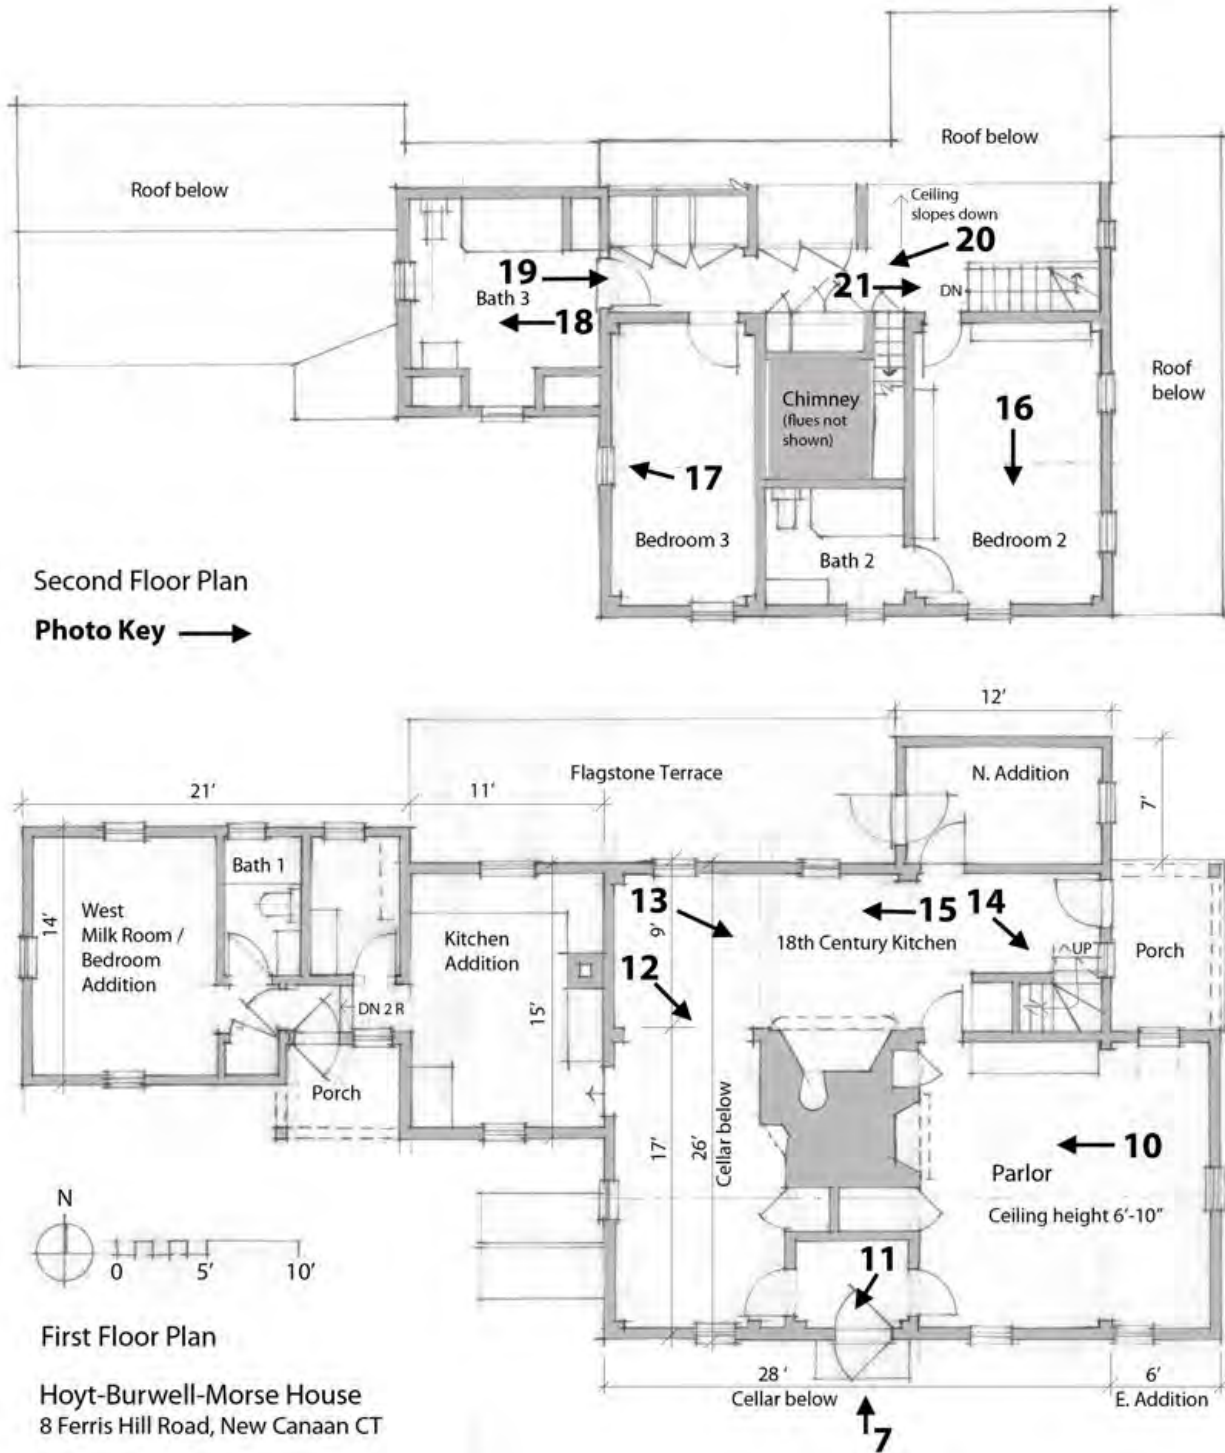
Hoyt-Burwell-Morse House: First and Second Floor Plans. Interior photo locations are indicated. Photos 9 and 22-24 are not indicated, as their locations are in the cellar or attic.
